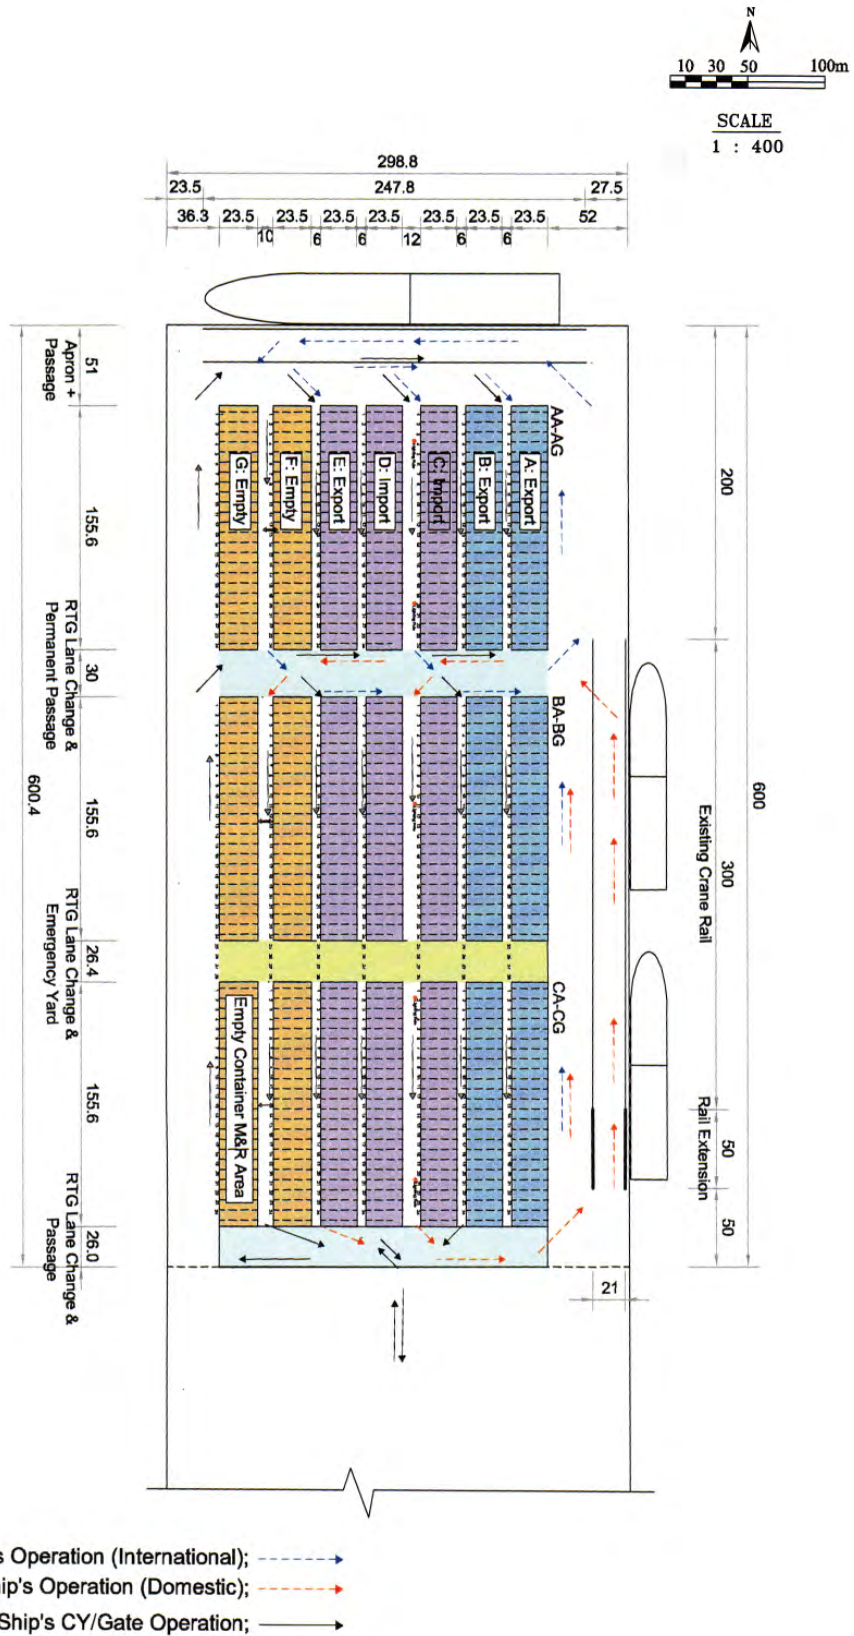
Facility Layout Plan of the Case Study Area of Pier 3
